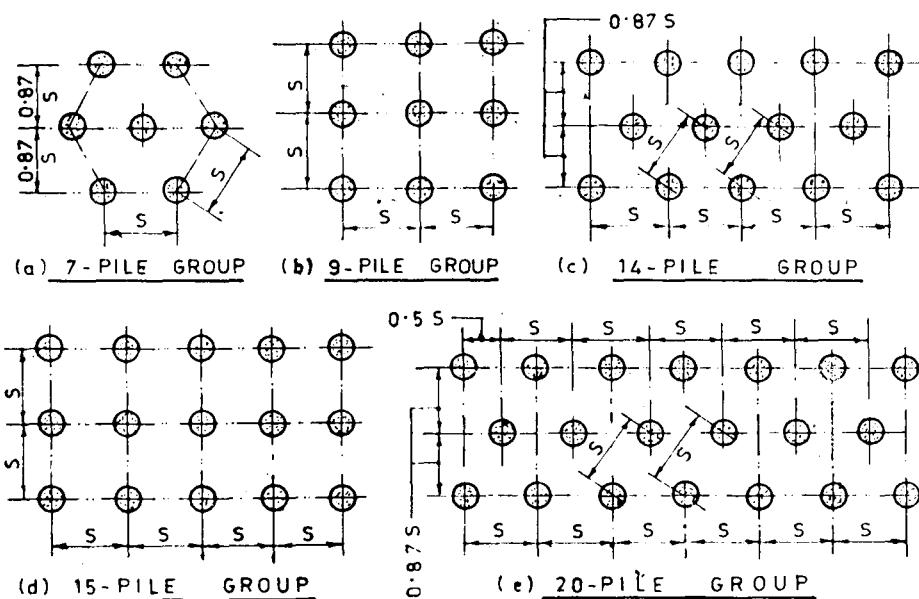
TYPICAL ARRANGEMENT OF PILE GROUPING (Teng)<sup>19</sup>
